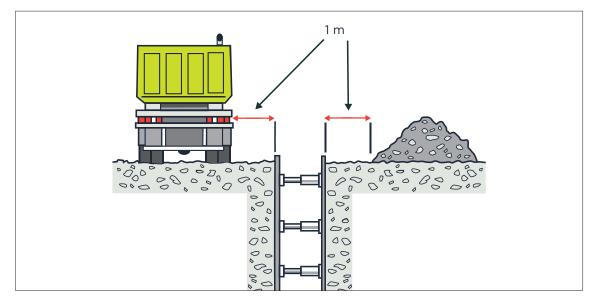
A shored excavation designed to carry soil, vehicle and spoil loads
